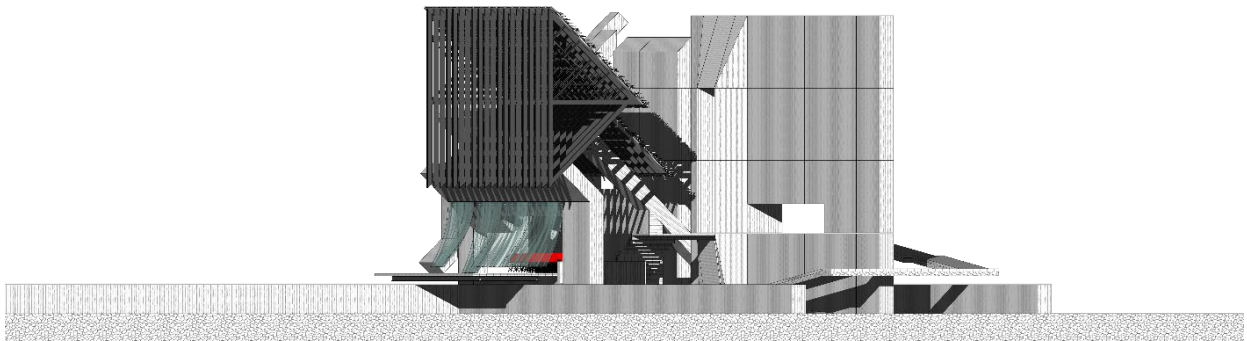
Hideaway Park Folly, True West Elevations, by Author
